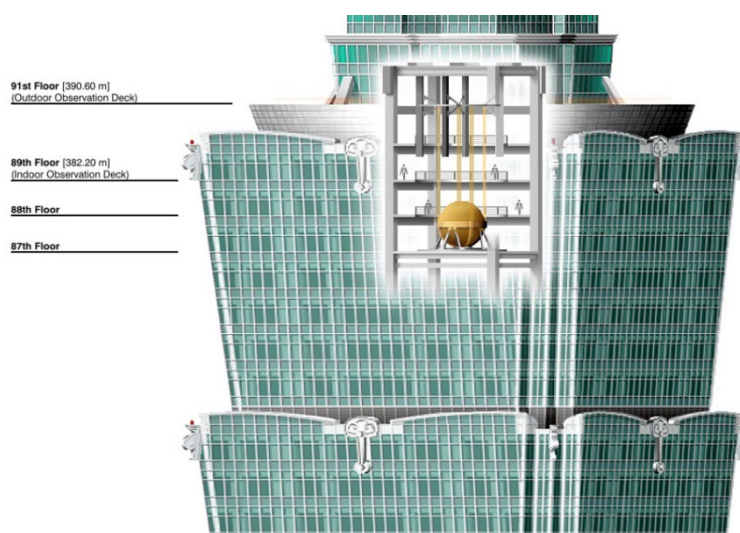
19: Location of Taipei 101's tuned mass damper between 87th and 91st floor.
